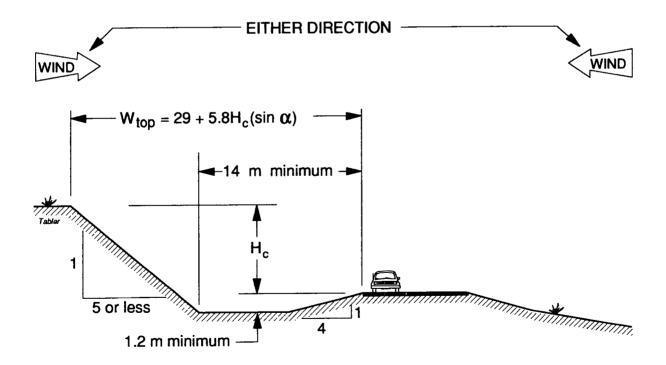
Proposed section for cuts to prevent drift encroachment where upwind terrain is flat or slopes downward toward the road (Tabler 1993).
